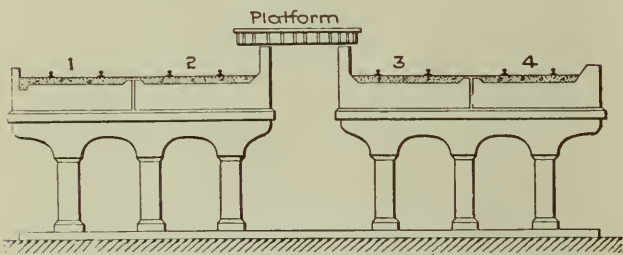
TYPICAL STATION ARRANGEMENT WITH ISLAND PLATFORM AND THREE-POST DOUBLE-TRACK CONCRETE TRETTLES
